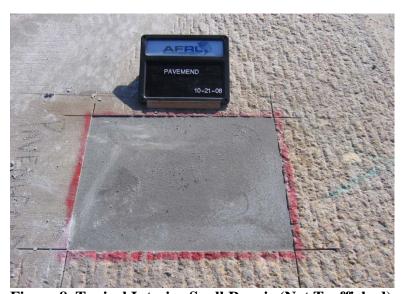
Typical Interior Spall Repair (Not Trafficked)
